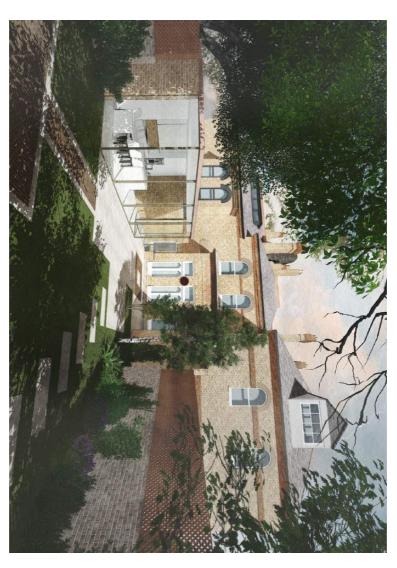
VISUAL FROM GARDEN LOOKING BACK TO THE PROPERTY AND THE PROPOSED EXTENSION AND LANDSCAPE
